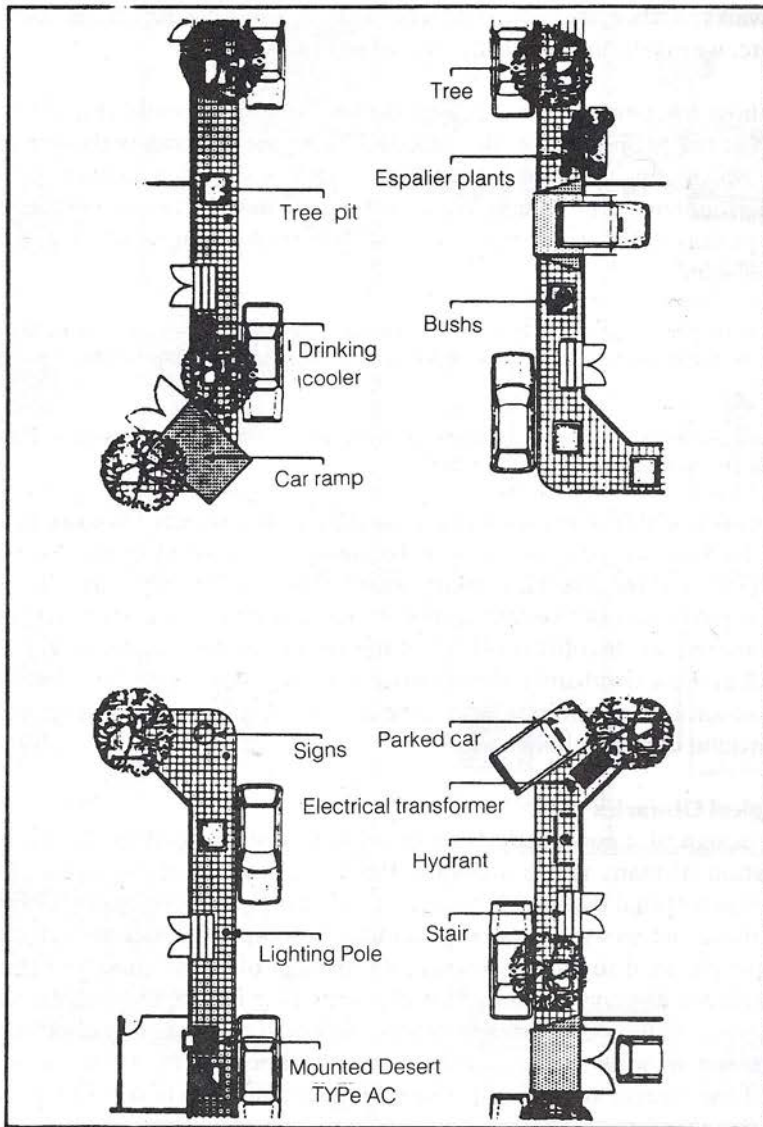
A plan of a typical street with sidewalks in a contemporary neighborhood shows the location and the type of barriers which existed on the sidewalks.
